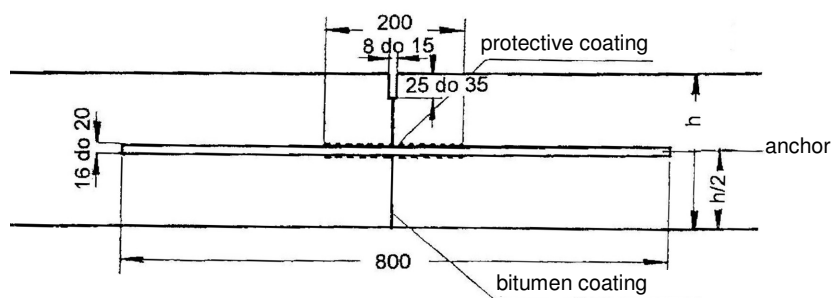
Longitudinal pressed joint with an installed anchor
